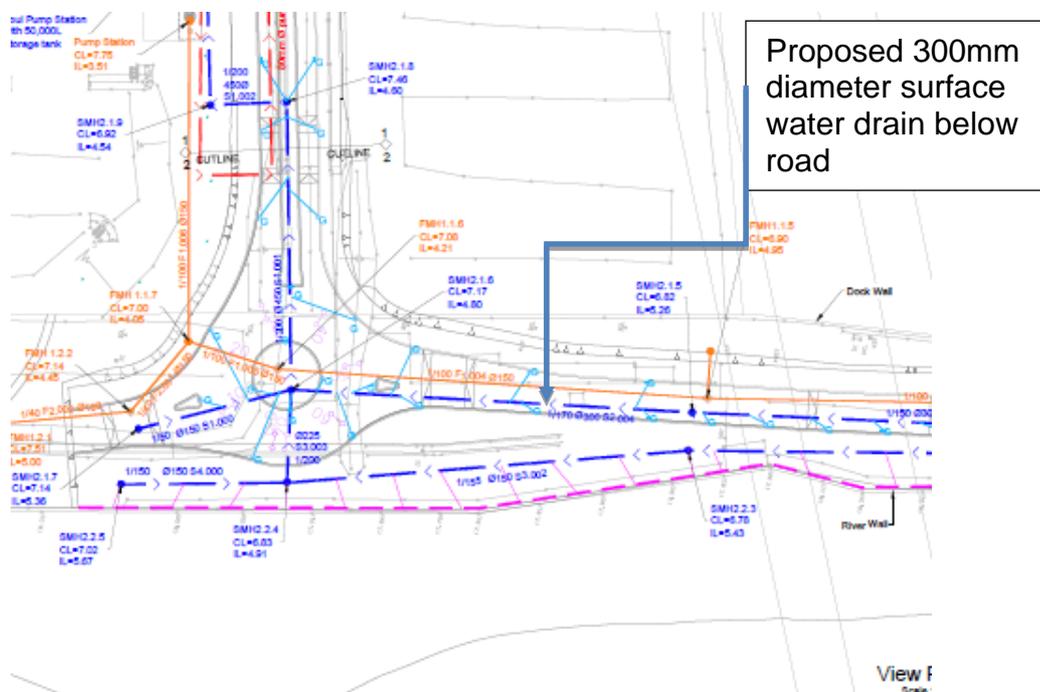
Road Drainage Extract One (Amey Consulting Drawing C000205341-H-D-NLR-500)
